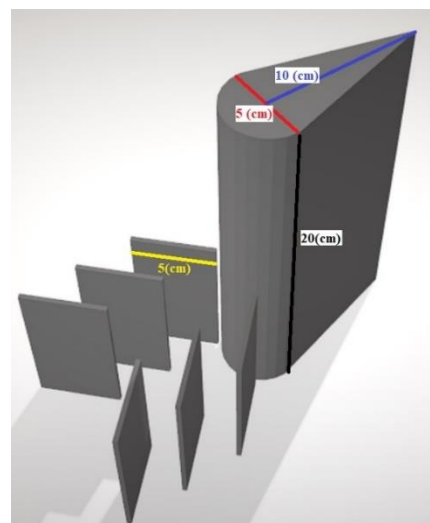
Schematic of a spindle-shaped bridge pier with plates
